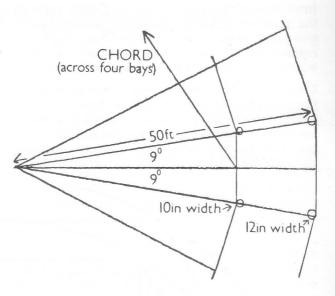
detail of plan, showing interior gallery wall uprights, uprights supporting exterior walls, and gallery width. (Scale: 1/16in = 1ft)
